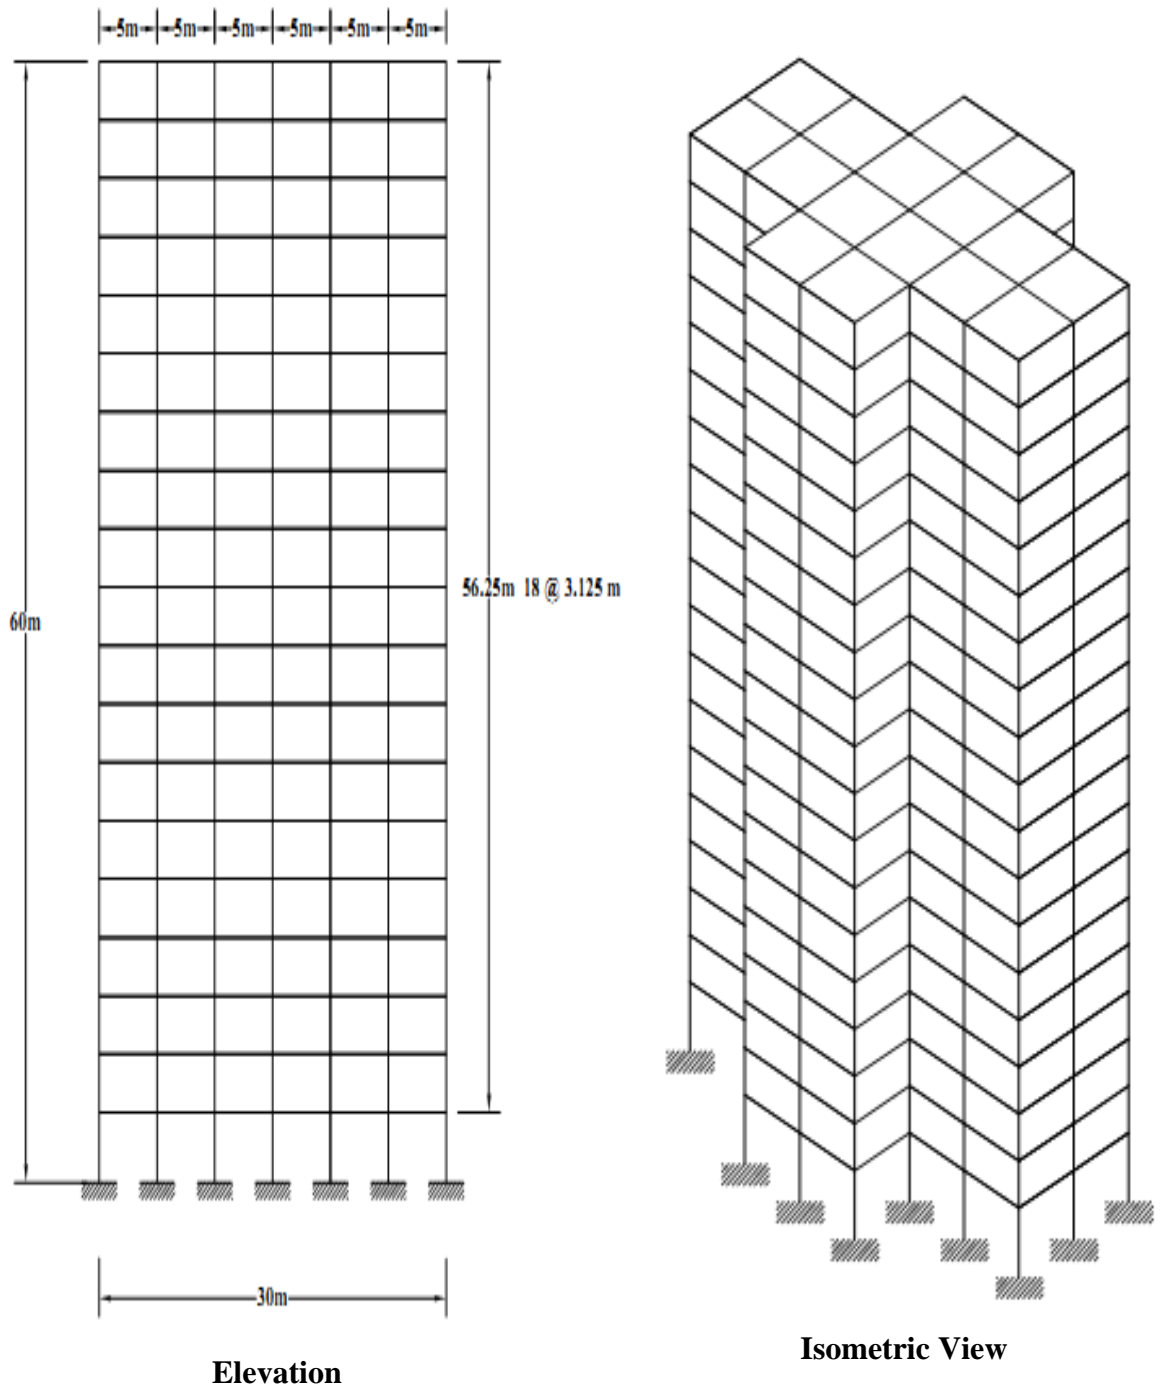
to 6.14 represent front elevations and isometric views of all seven prototype buildings.
